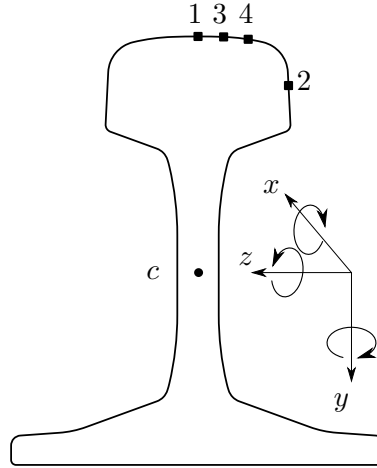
Measurement locations across the rail cross-section on University of Southampton test track
